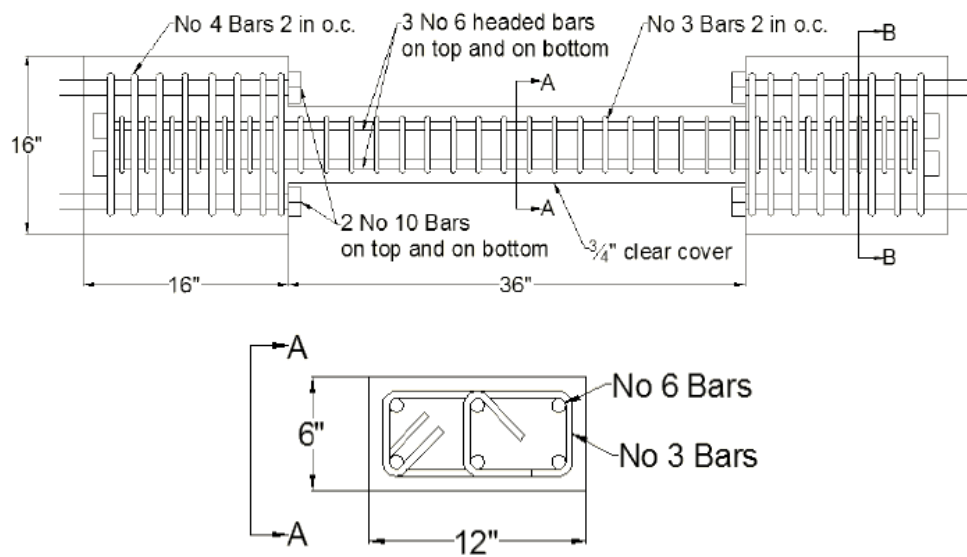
Plan view and Cross-section of boundary element specimen [21]
